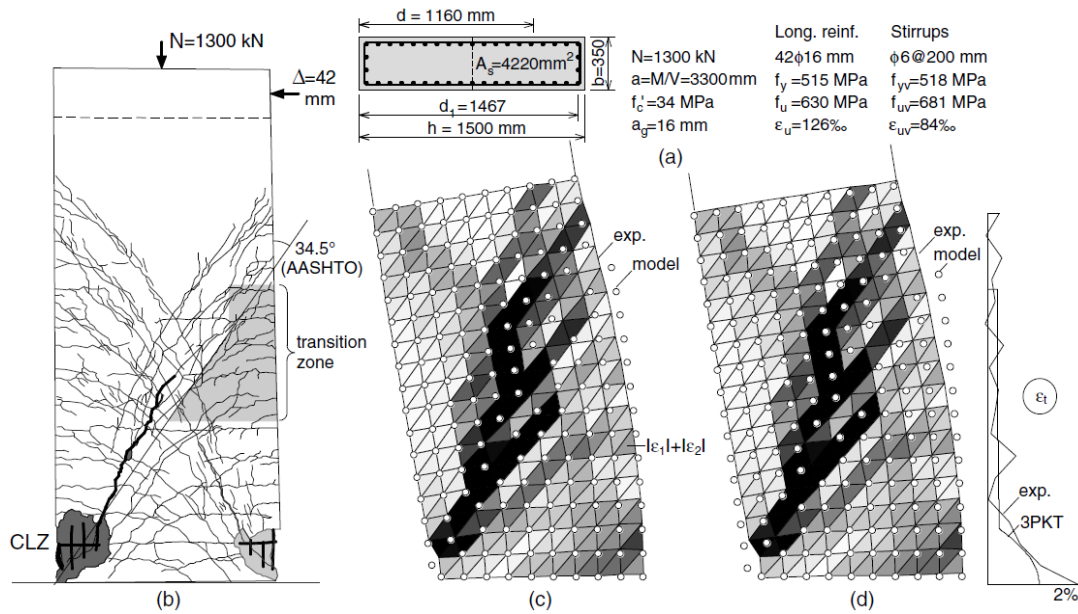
Deformation patterns in shear-dominated walls—specimen VK3 (Bimschas 2010): ((a) wall properties; (b) crack pattern at failure; (c) deformations at failure $\times 15$ and 3PK model with fitted DOFs; (d) deformations at failure and 3PK model with predicted DOFs) (Mihaylov et al. 2016)
